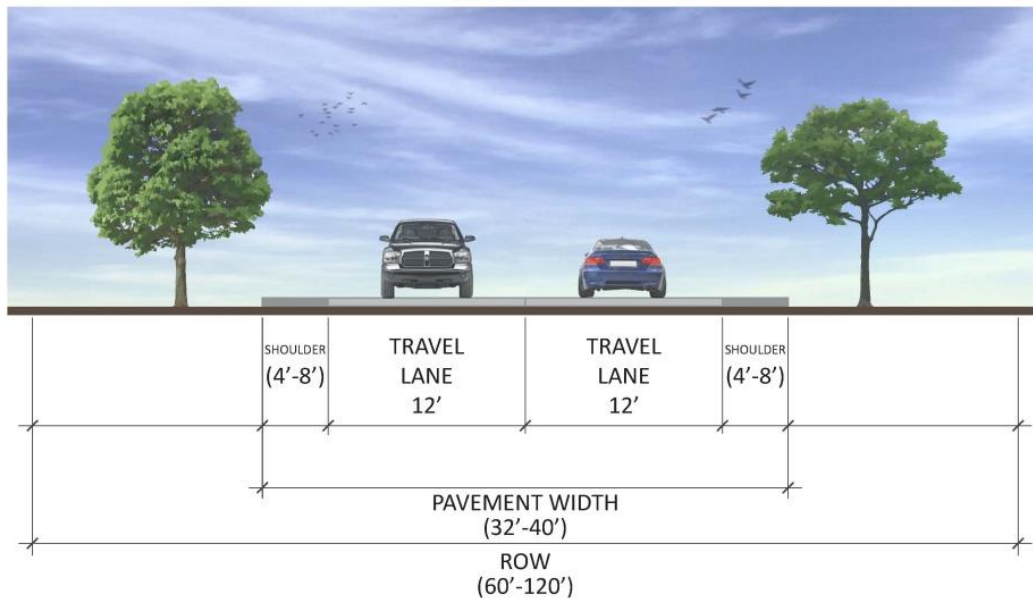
Proposed Rural Arterial Cross-Section
